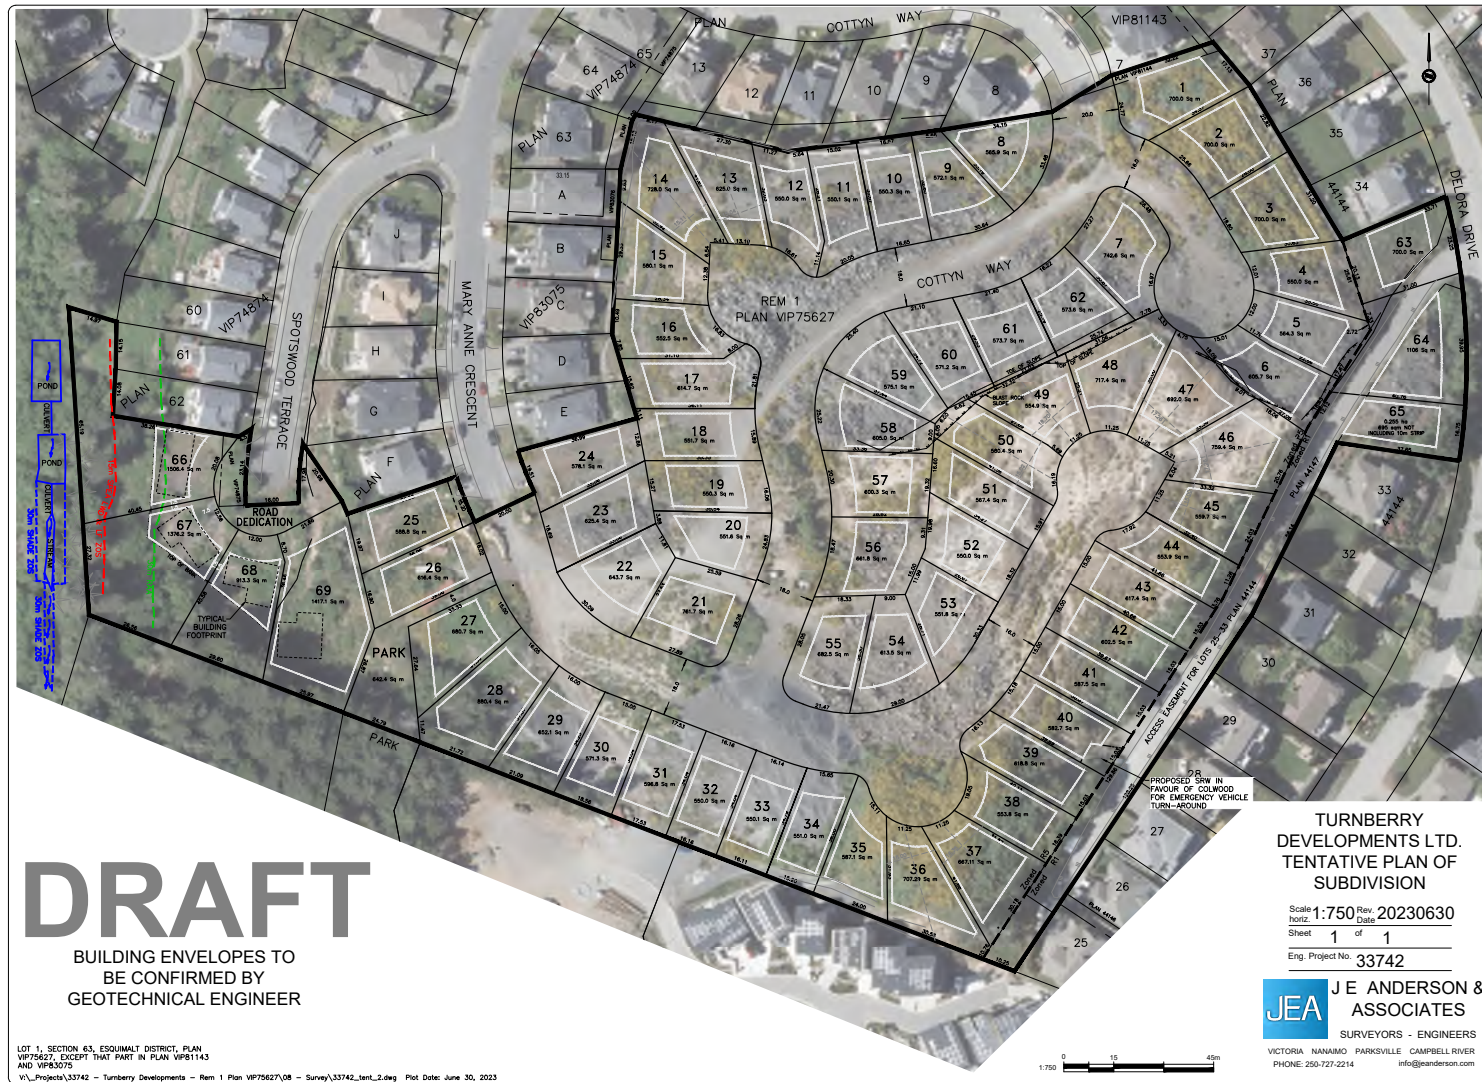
Site Plan, superimposed on aerial image, showing the property boundary (solid black line), proposed lot layout, internal road alignment and connection to adjacent subdivision roads, stormwater management ponds on the west side of the property (blue watercourses)(SPEA = dashed red line; RAA = dashed green line), mature tree canopy associated with latter watercourses, existing property disturbance footprint, and proposed SRW in favour of Colwood for Emergency vehicle turn-around (yellow arrow). Contrast this aerial image with those of Figure 6 and Figure 7.
